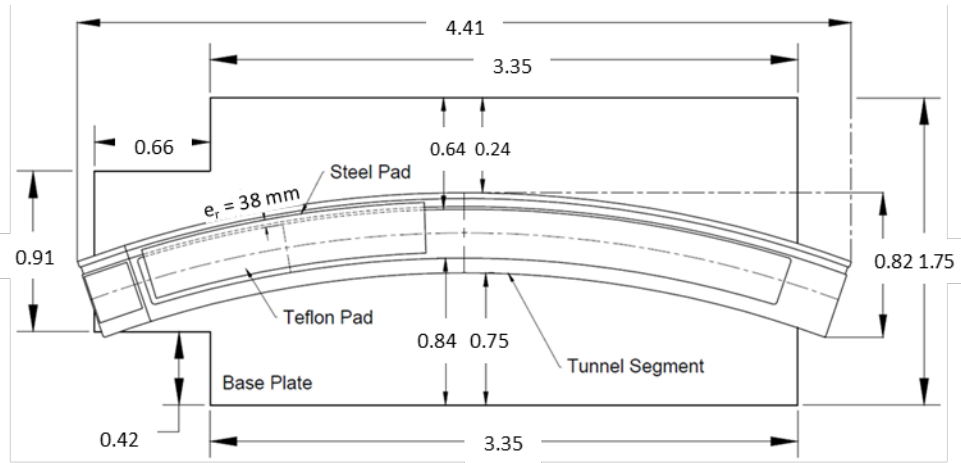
Plan view of load pad location at top and bottom of segment (dimensions in m).
